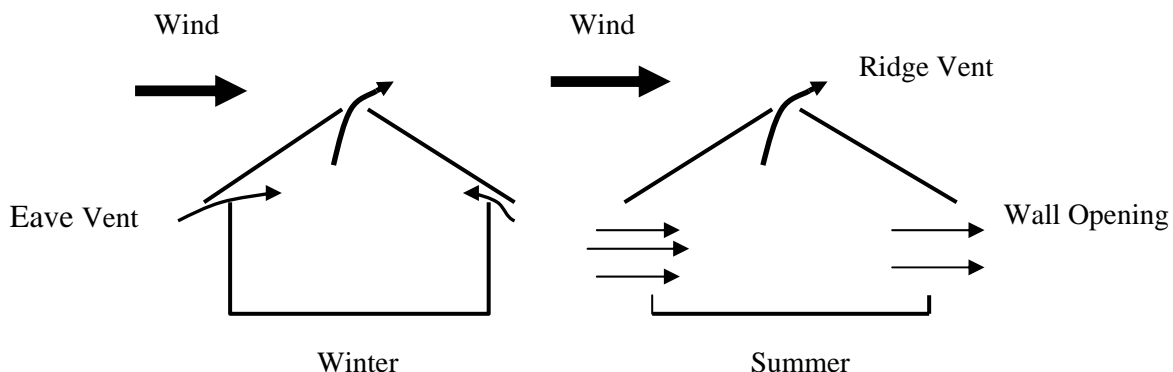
Typical openings used for natural ventilation of dairy buildings.
